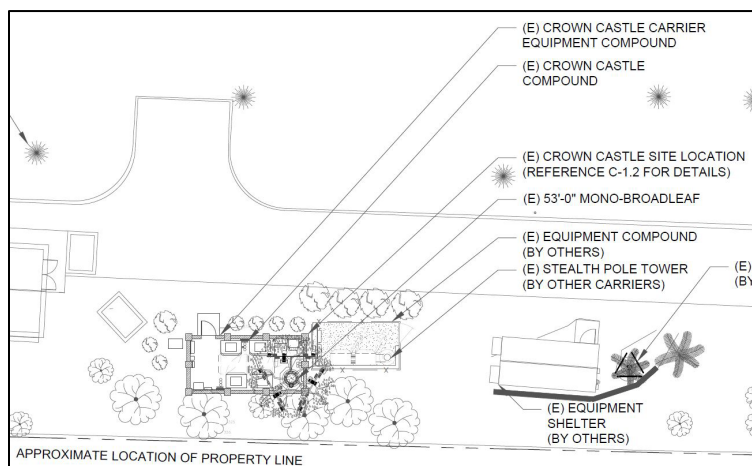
Site plan of AT&T's wireless facility (Source: Plans, Page C-1.2, Panel 1).
